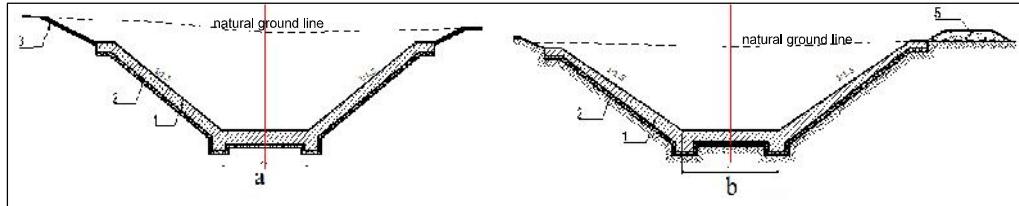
Cross sections: a - connection channel (CL); b - inclined drop (CR1), 1 - concrete slabs, 2 - ballast layer, 3 - grassy slope, 4 - natural ground, 5 - embankment (Luca et al., 2004)
